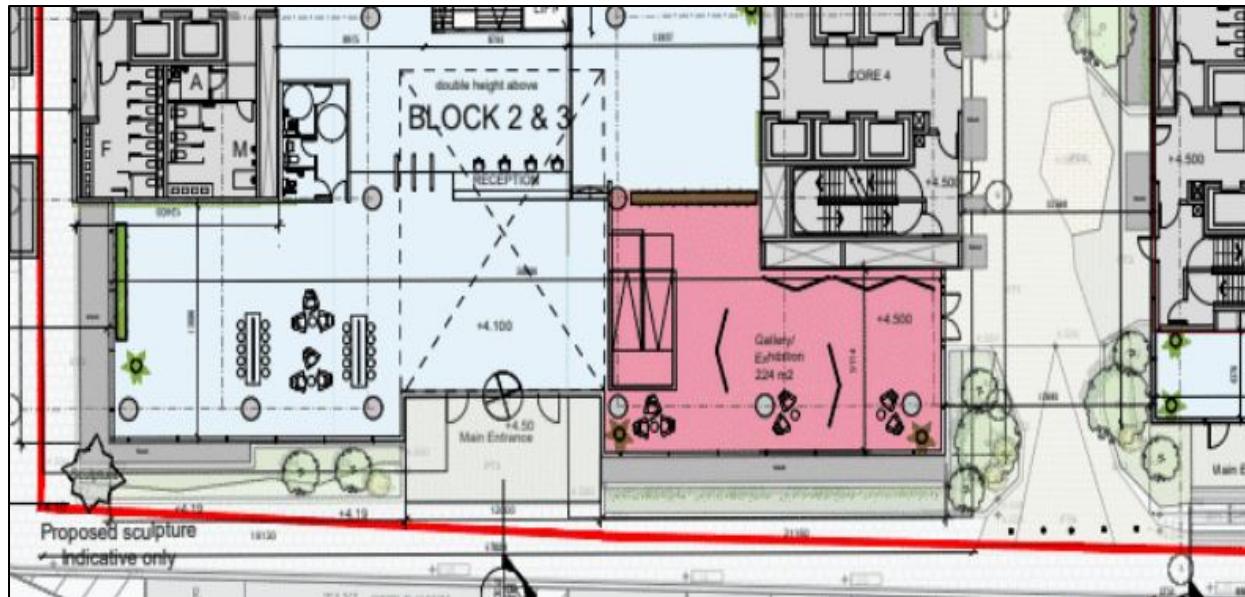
Extract of Dwg. No. Z1010 (Rev. 6), 'Ground Floor Plan', prepared by HJL, showing location of gallery / exhibition space at North Wall Quay. Cropped by TPA, January 2021. This drawing is included as Appendix D in the Waterfront South Central – SHD Proposal – Assorted Appendices, prepared by TPA and dated Thursday, 28 January 2021.
